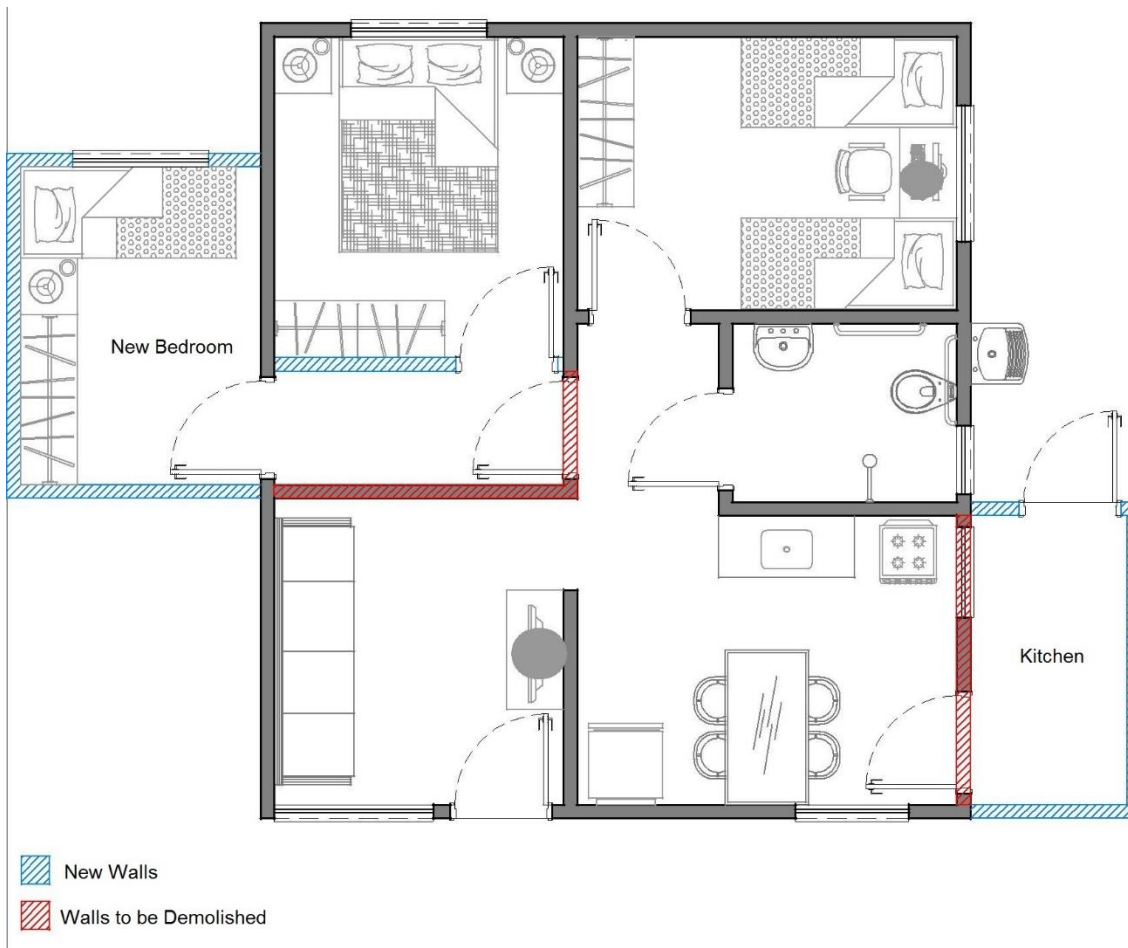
Floor plan of house for people with special needs of Joao Alberto Amorim estate, with one extra bedroom and extended kitchen.
